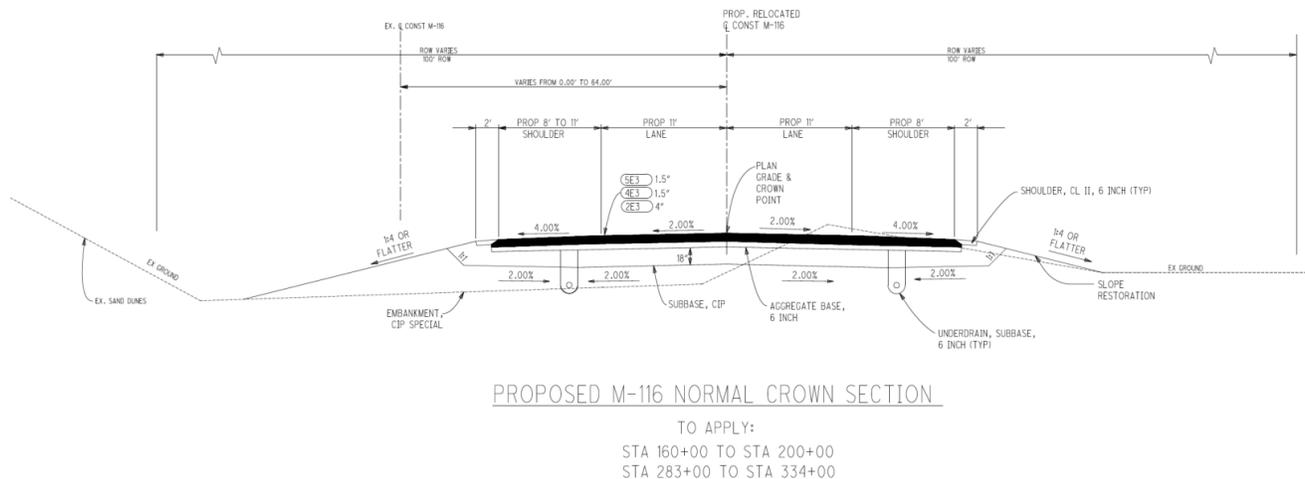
Proposed M-116 Ludington State Park typical roadway section.
